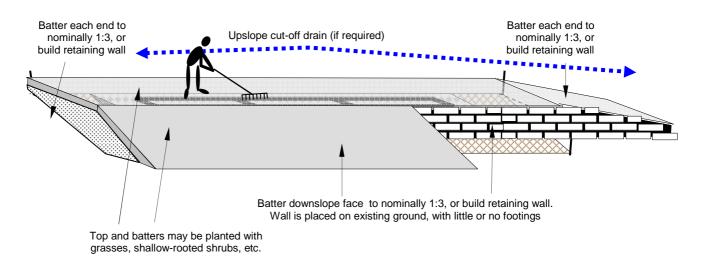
Step 16. Place topsoil over the filter cloth to the specified thickness. Grade topsoil, or build retaining walls
